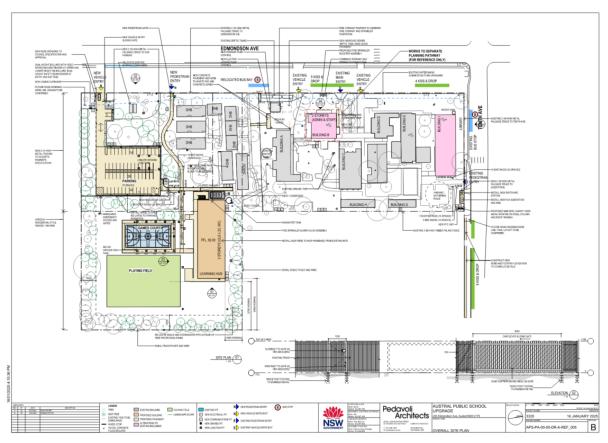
Proposed Site Plan (Source: Pedavoli Architects, Overall Site Plan (Rev B)
